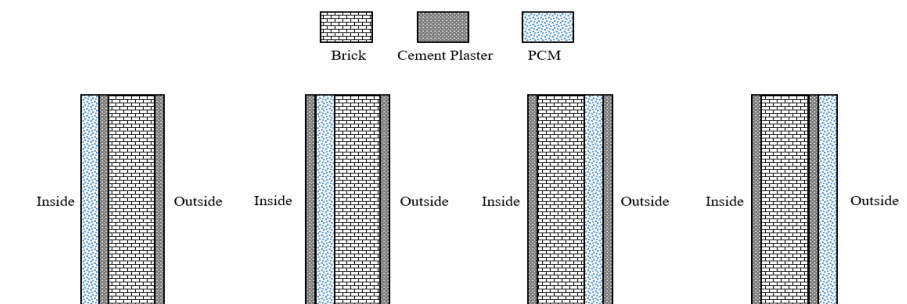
PCM Placement in Walls a) Wall A b) Wall B c) Wall C d) Wall D
